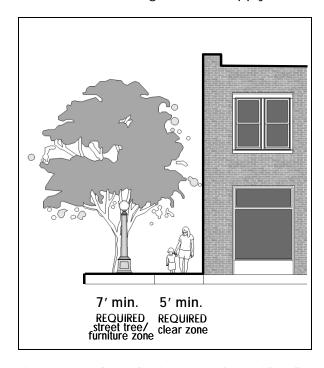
TOD Pedestrian Priority Street sidewalk width requirements.
